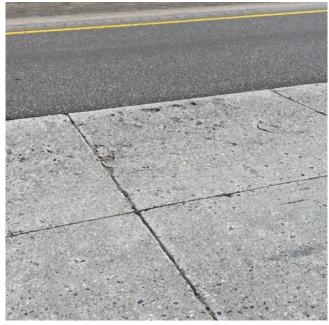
Mid-Section- Reference Slab -12 months Severe Surface Damage, Joint Rot, Pitting, Pop Outs
